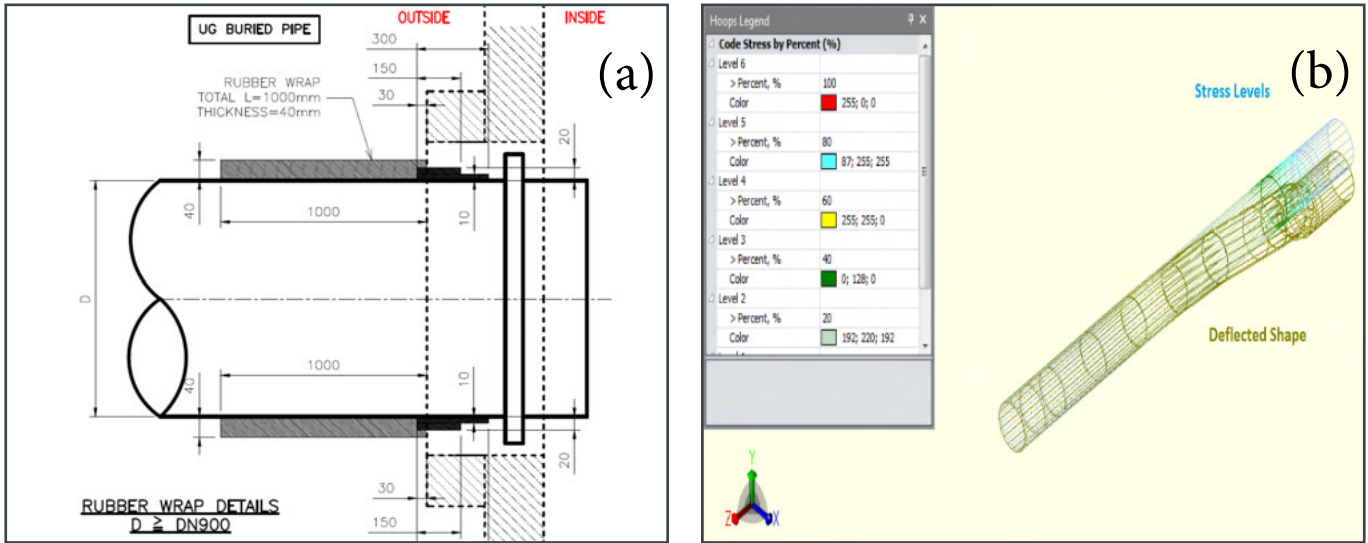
a – flexible wrapping adjacent to concrete. b – simulation of settlement with rubber wrapping
